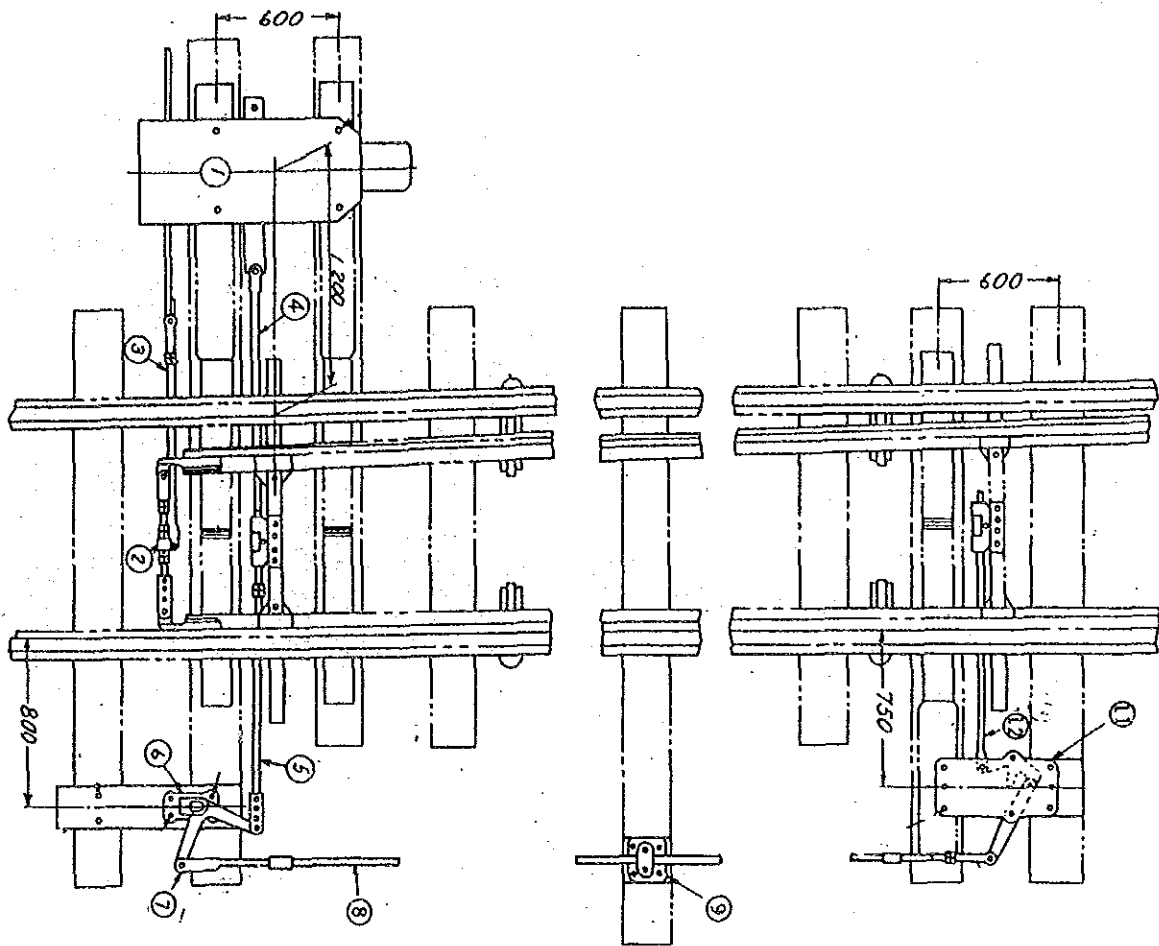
Installation of Locking Device for G-CL Type Point Machine
